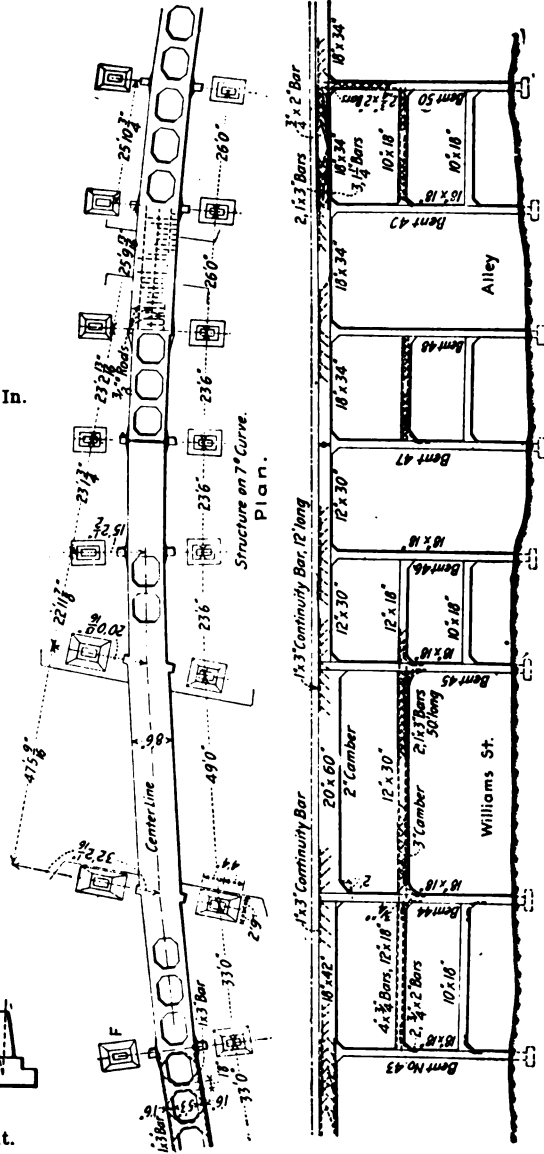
Plan and Elevation, Showing Construction of Richmond Viaduct.
